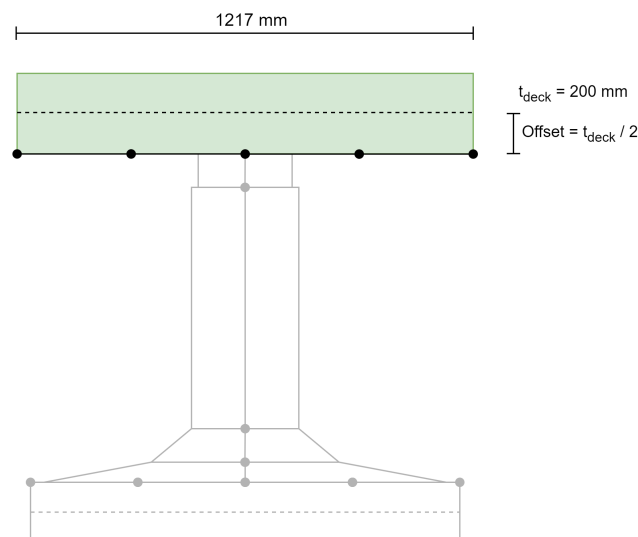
Arrangement of shell elements and dimensions for modelling inverted T-girders and edge girders
